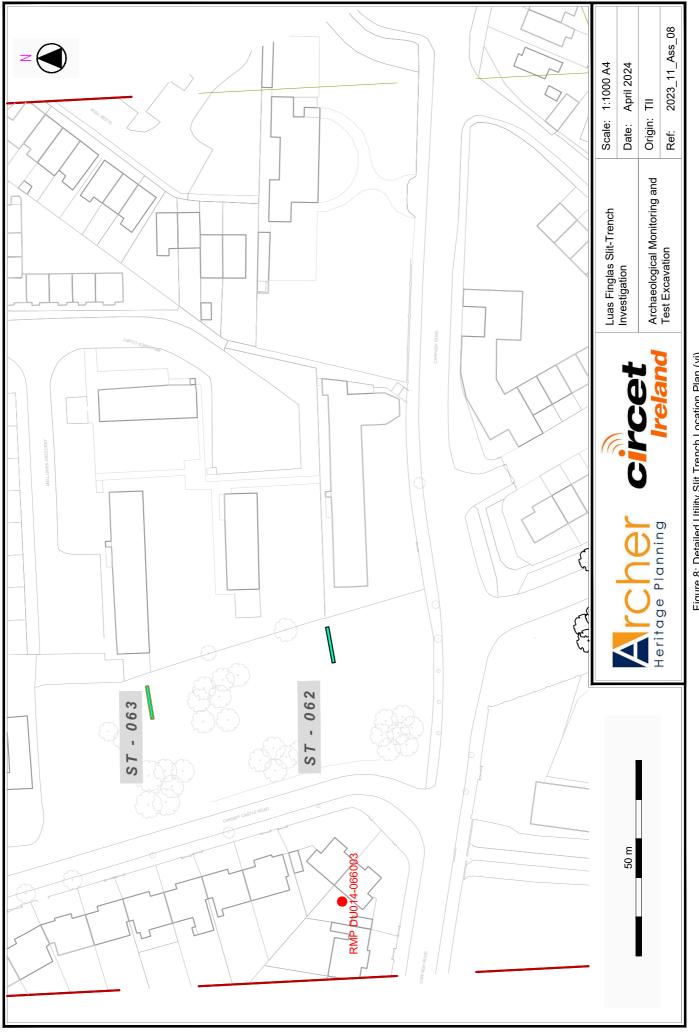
Detailed Utility Slit Trench Location Plan (vi)
